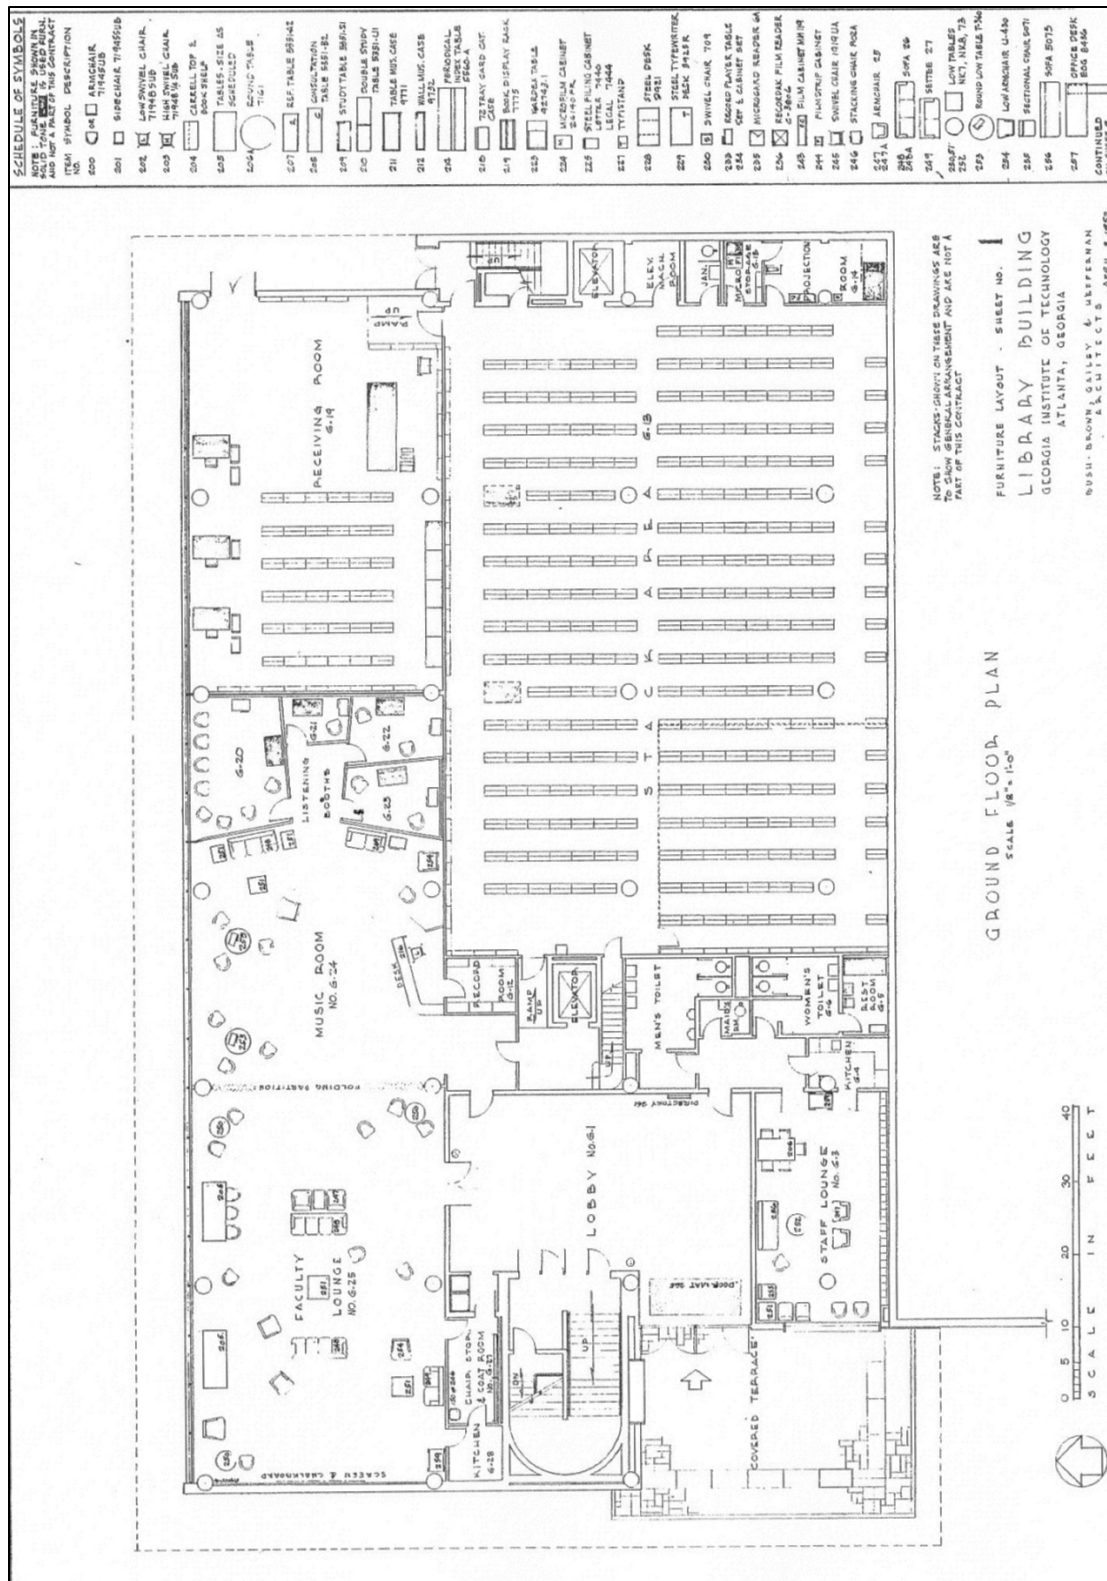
Original ground floor plan and furniture layout; Dedication Brochure. *Georgia Tech Archives. UA415A, Series 3: Subject Files: Buildings and Grounds, ca. 1900-ca. 2011, Box VF35, Folder 24.
